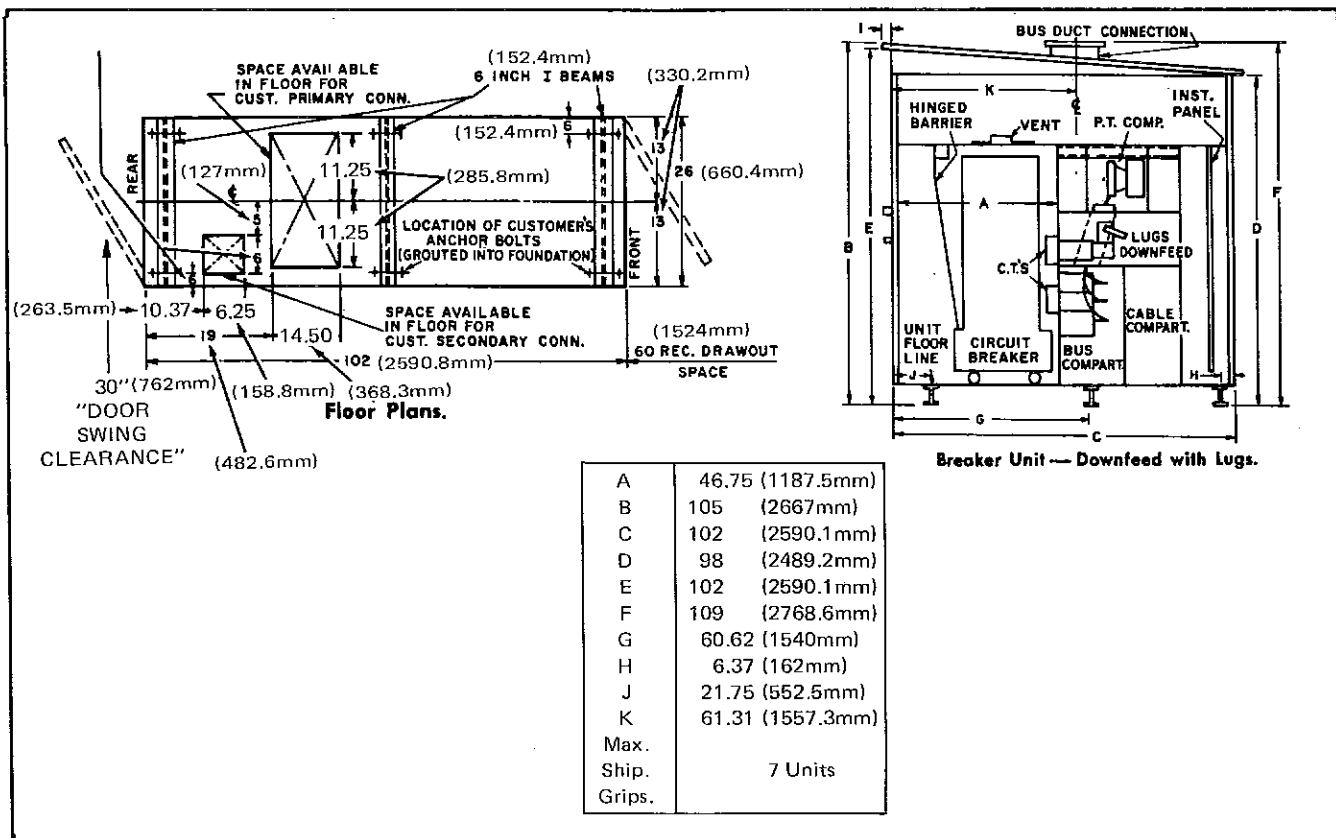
Floor Plan and Typical Side View of 5 kV Conventional Outdoor Cubicles
